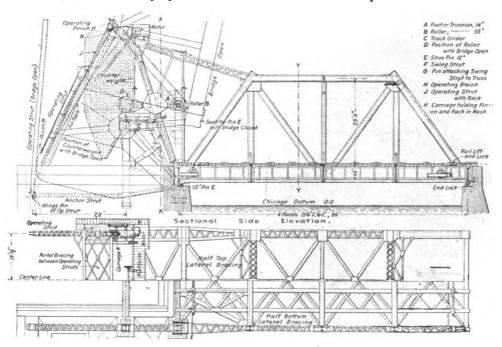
Plan of double track railroad bascule bridge over East Chicago River.
